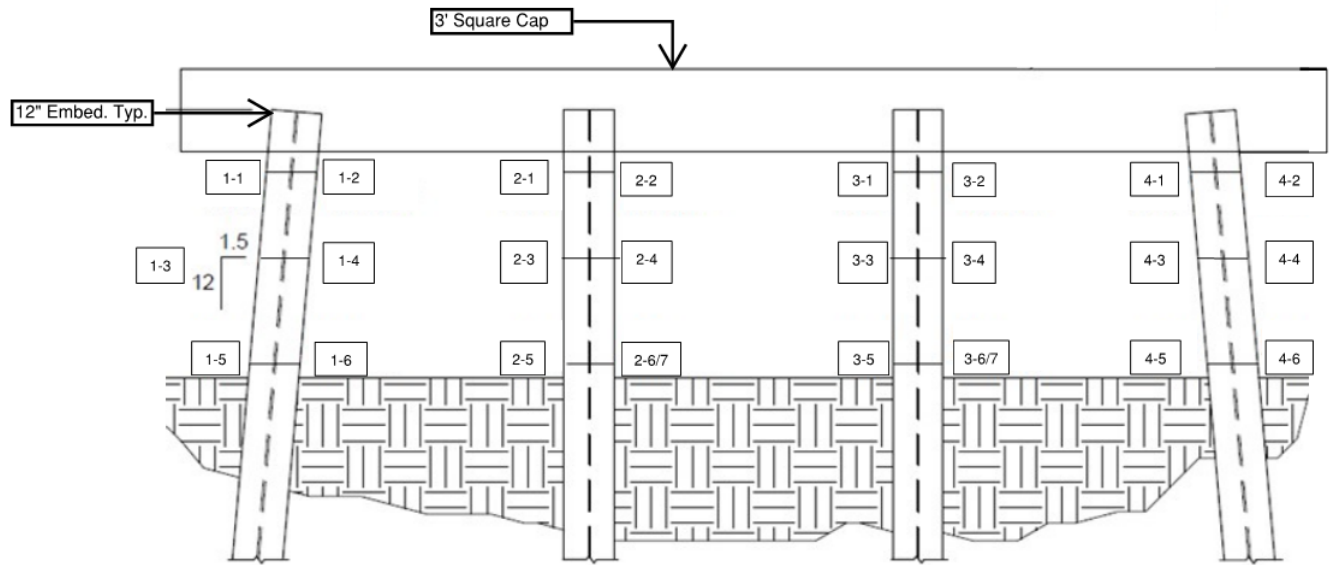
AUNGES Battered Pile Test Bent Gage Locations
